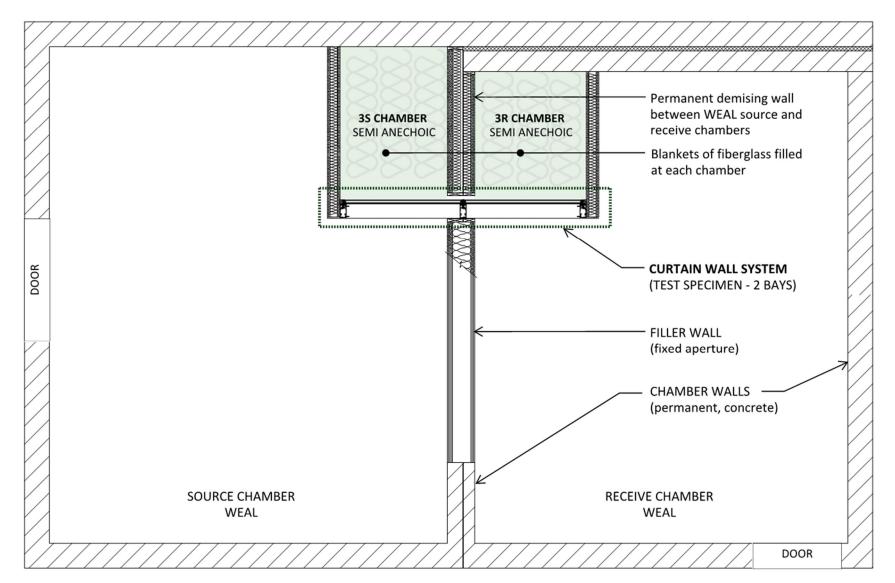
PLAN DRAWING OF AUXILIARY SEMI-ANECHOIC CHAMBERS 3S AND 3R CUSTOM BUILT FOR THE PHASE 3 TEST MEASUREMENTS
